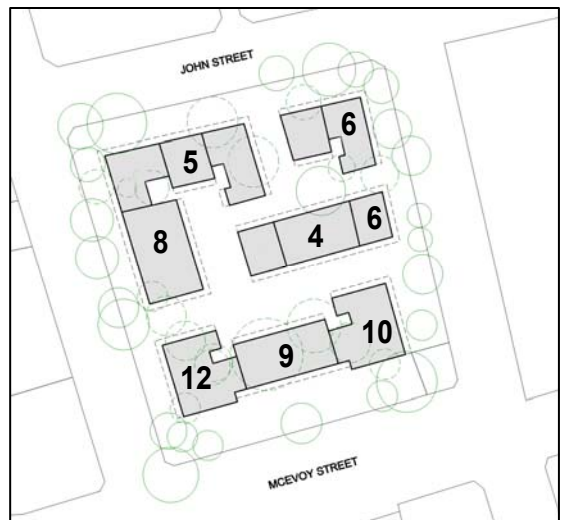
a, b. Yield testing (FSRs) Block 16
